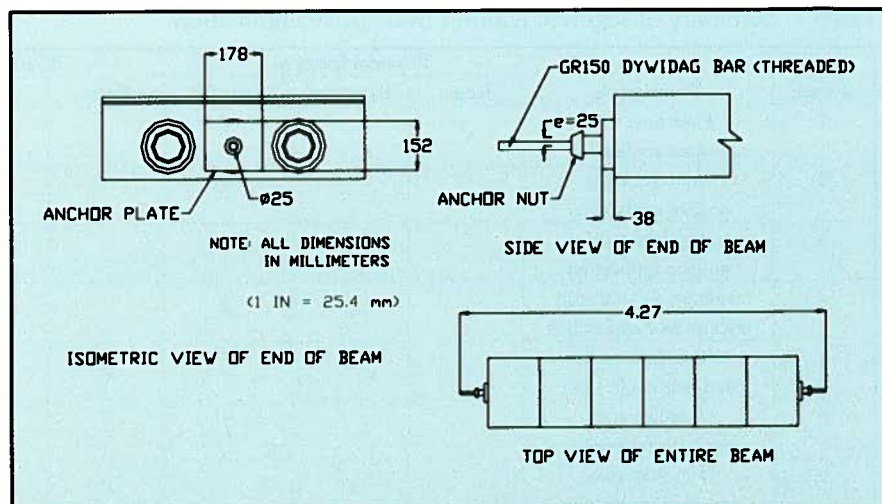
Dimensions of test segment showing various cross sections of beam.
